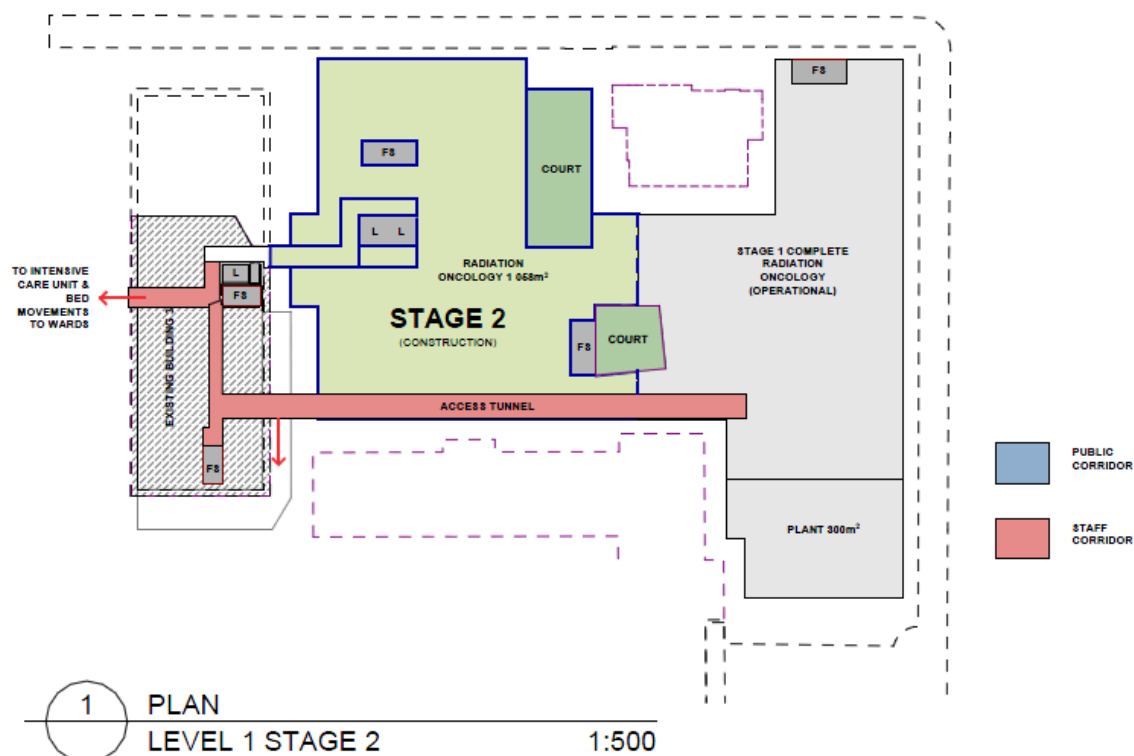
Plan showing Stage 2 works mostly above the existing building with basement.
